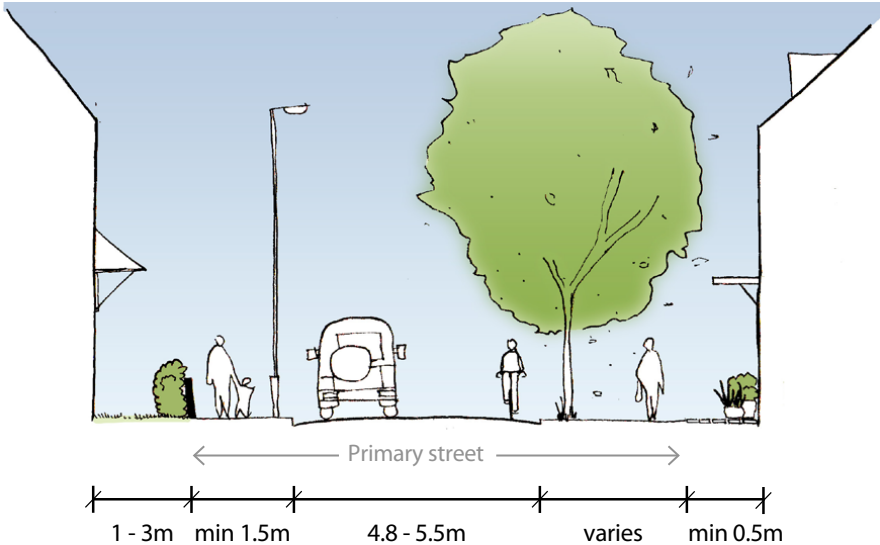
A-A – typical primary street cross section (refer to Fig. 16 for section location)
